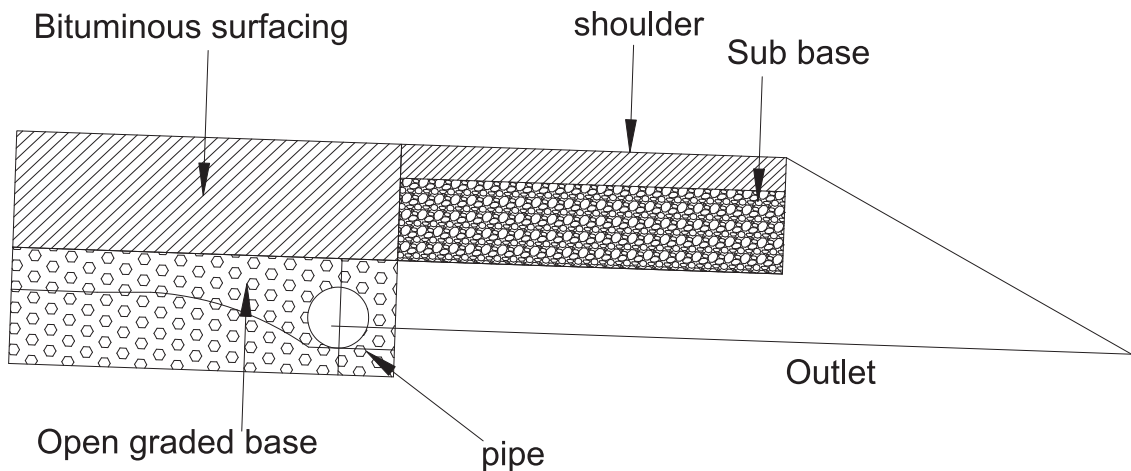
Longitudinal Pipe at the Edge of the Drainage Layer with Outlet Pipe
